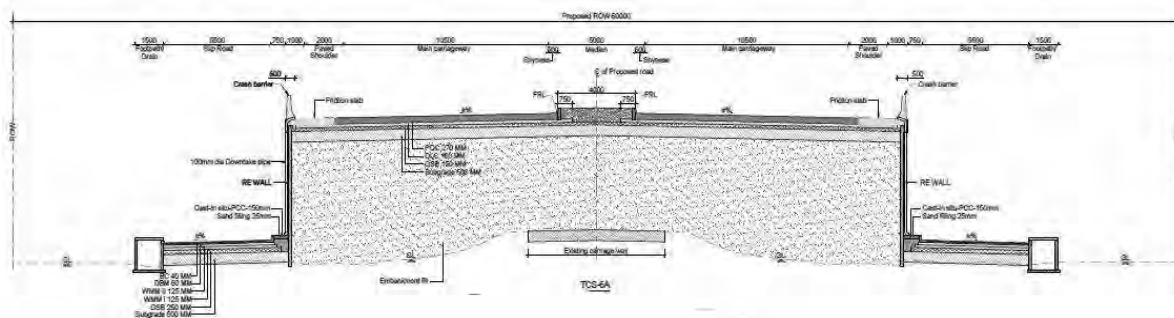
TCS-6A Typical Four Lane Underpass Cross Section with Slip Roads In The Existing Road
